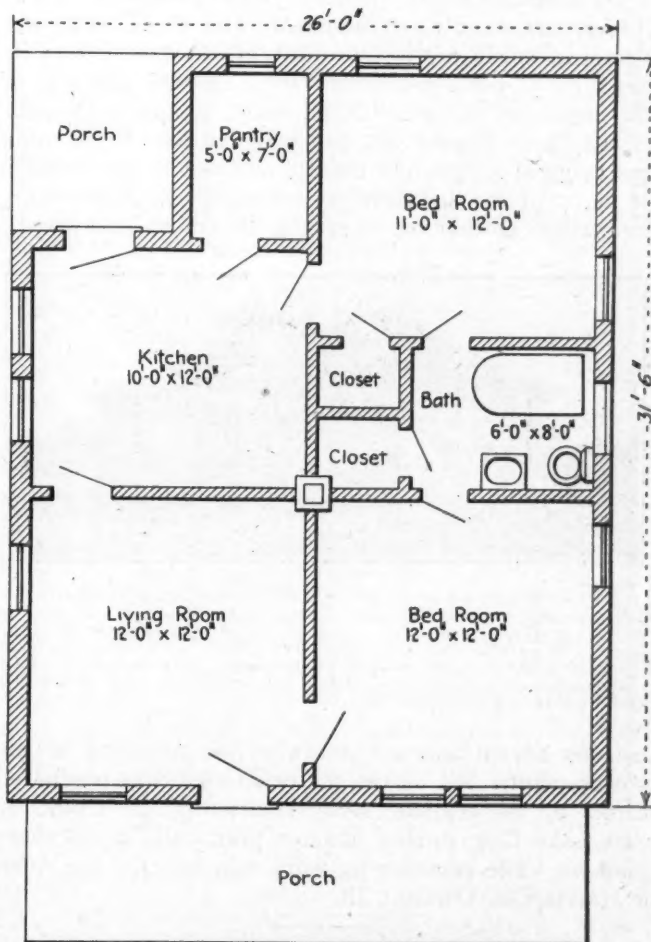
PLAN OF THE STANDARD MINER'S HOUSE
